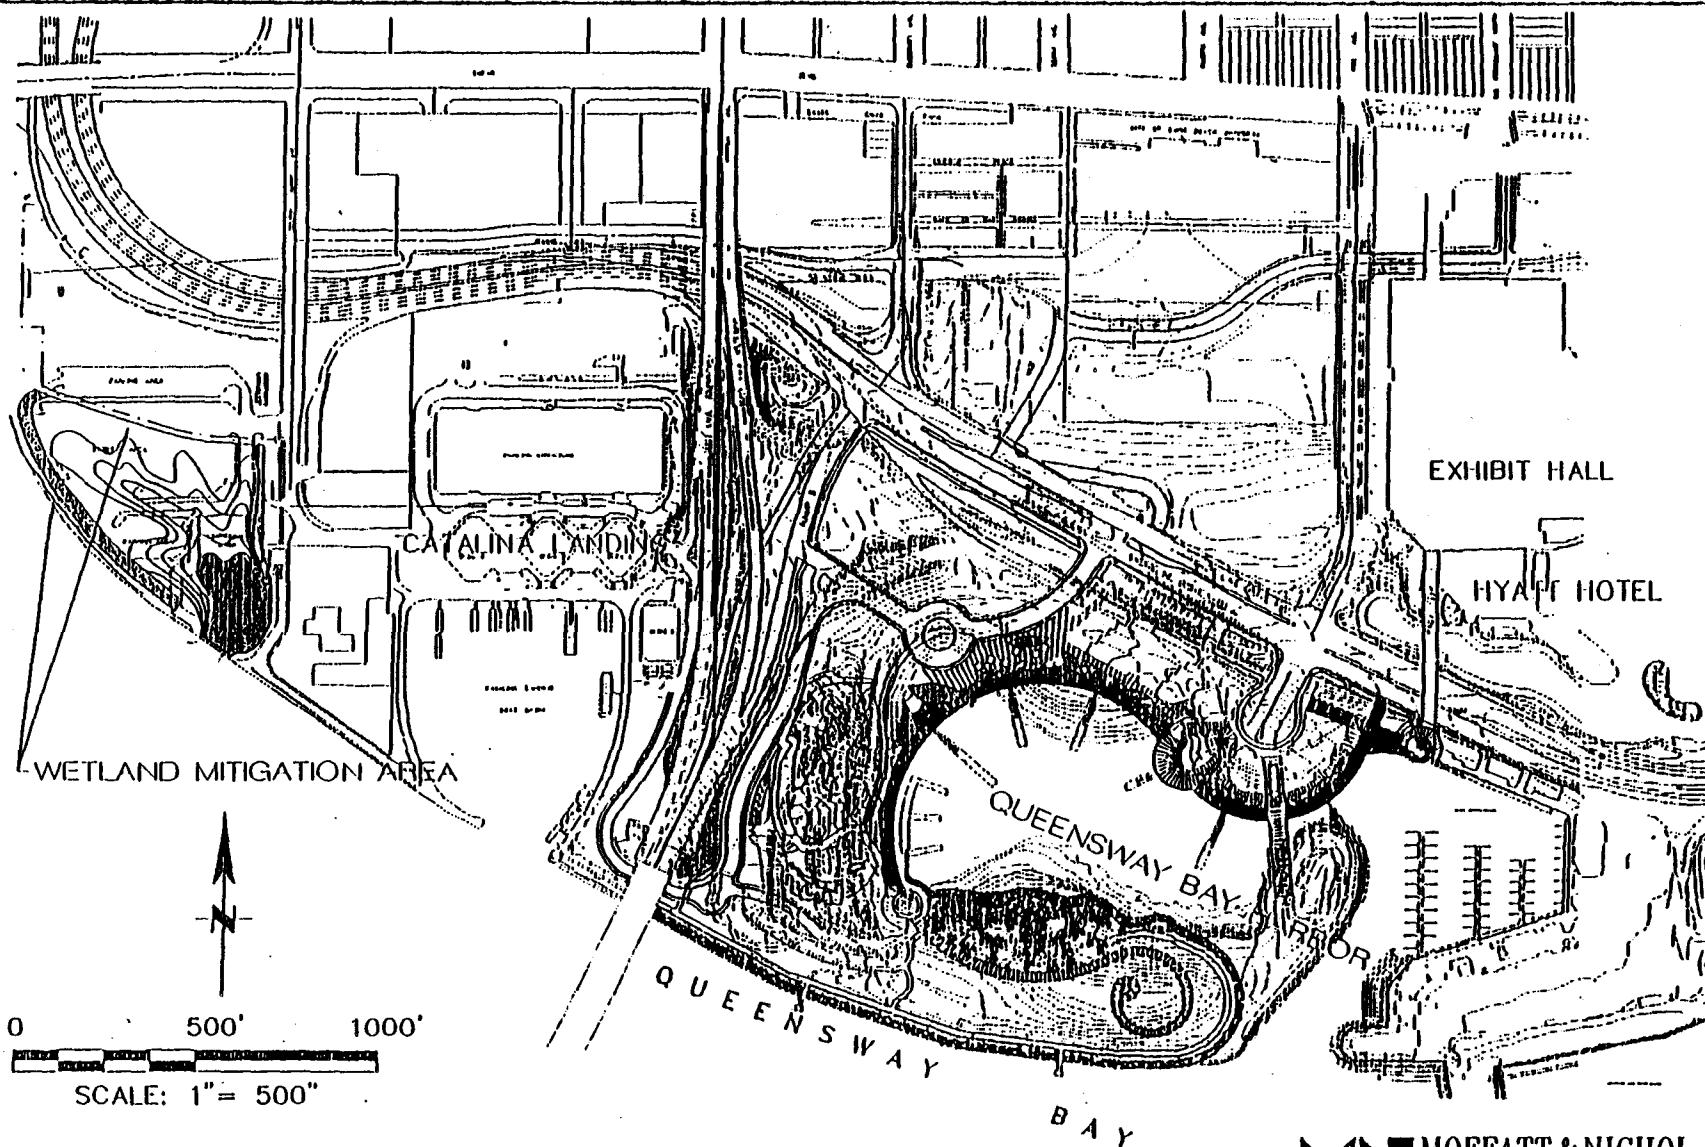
PROPOSED QUEENSWAY BAY PLAN,
